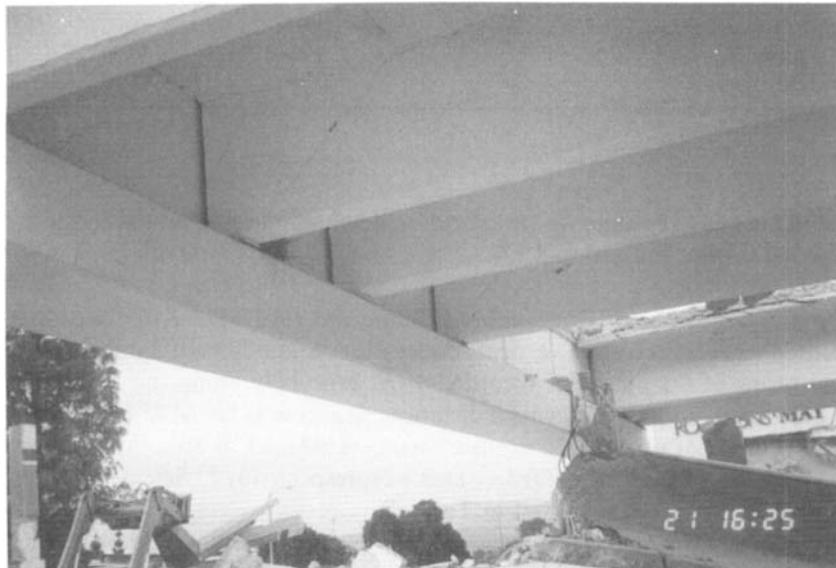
Northridge Fashion Centre north-west parking structure. Note cracks in floor and transverse beams. Photograph used with kind permission of Dr Said Hilmy
